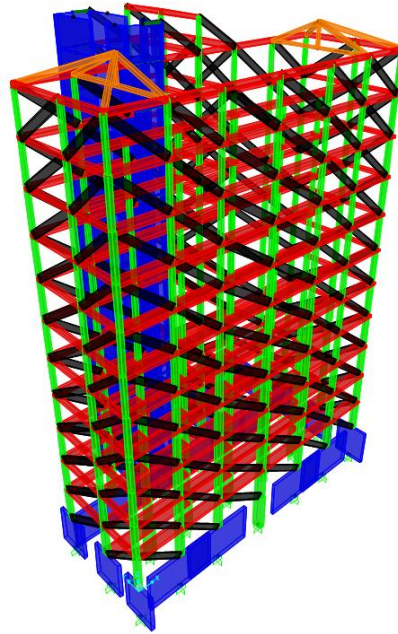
3D view of the numerical model of RC building 2, where also masonry infills in the outer walls have been modelled.
